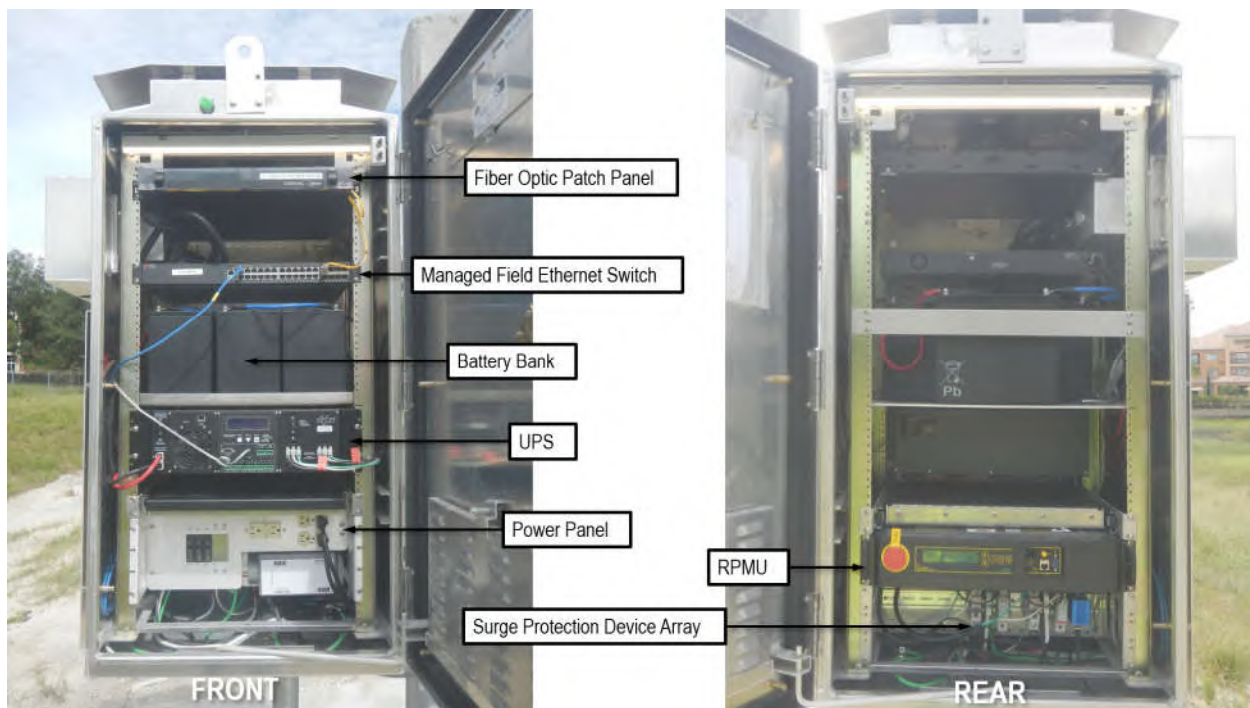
Example local hub cabinet assembly w/ in-cabinet equipment.
